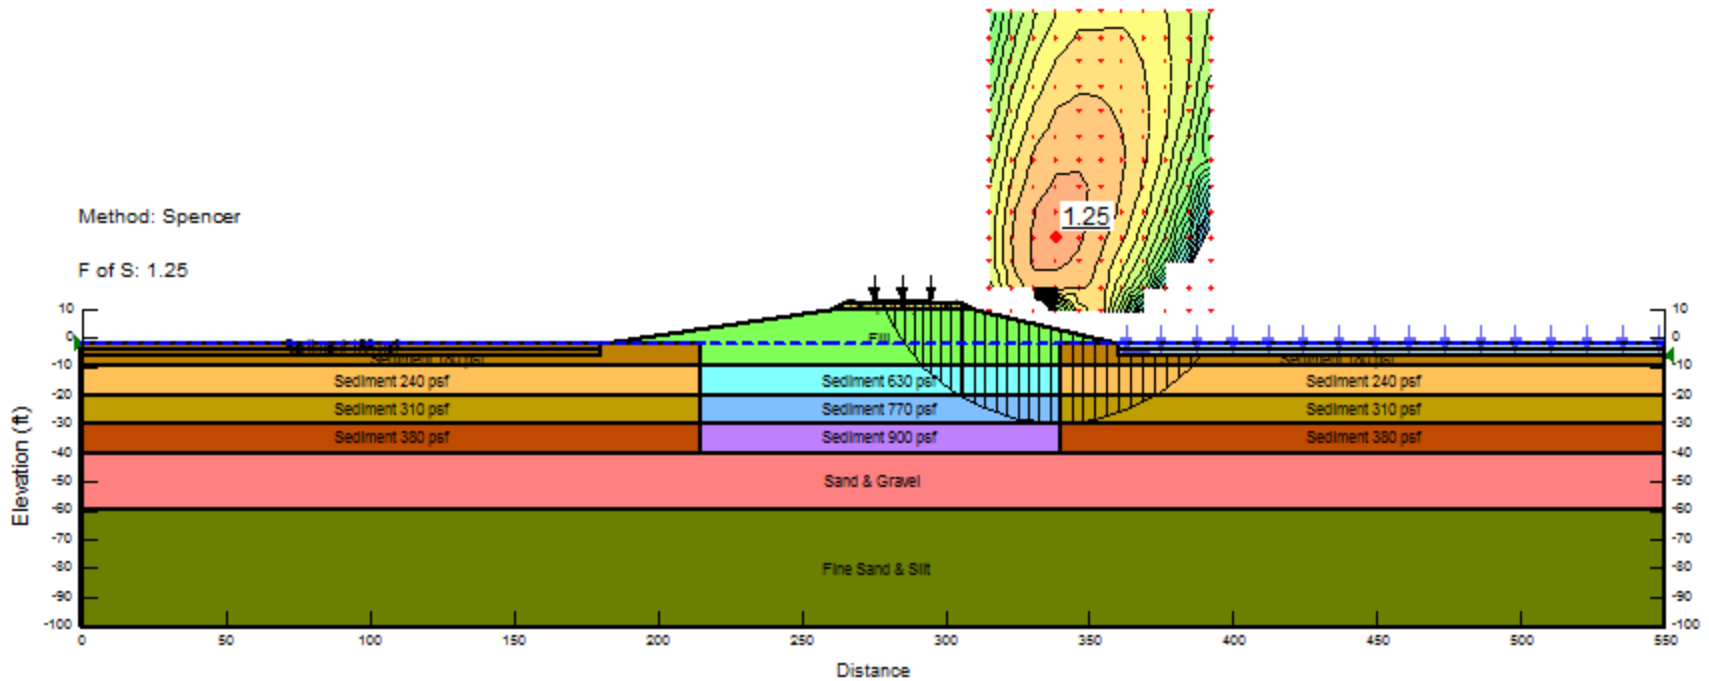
Causeway with 20-foot Wide, 500 psf Equipment Surcharge Load (4-foot Dredge)
